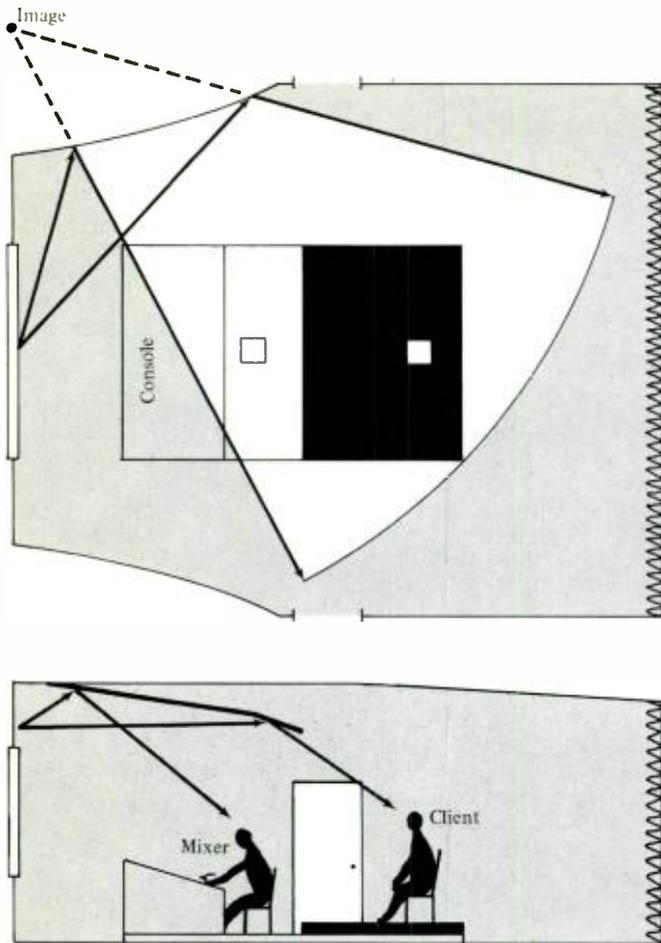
Recommended plan view and elevation for a control room of 5000 ft².
